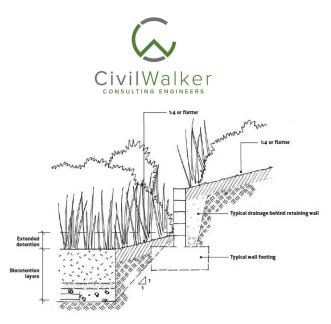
Typical Bio-Retention Basin Detail incorporating a Retaining Wall
